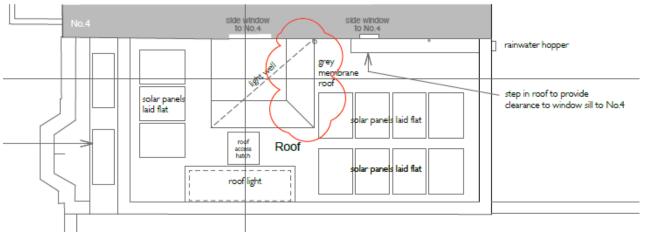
Location of lightwell in relation to No. 4 Parkhill Rd south facing stairwell window.
